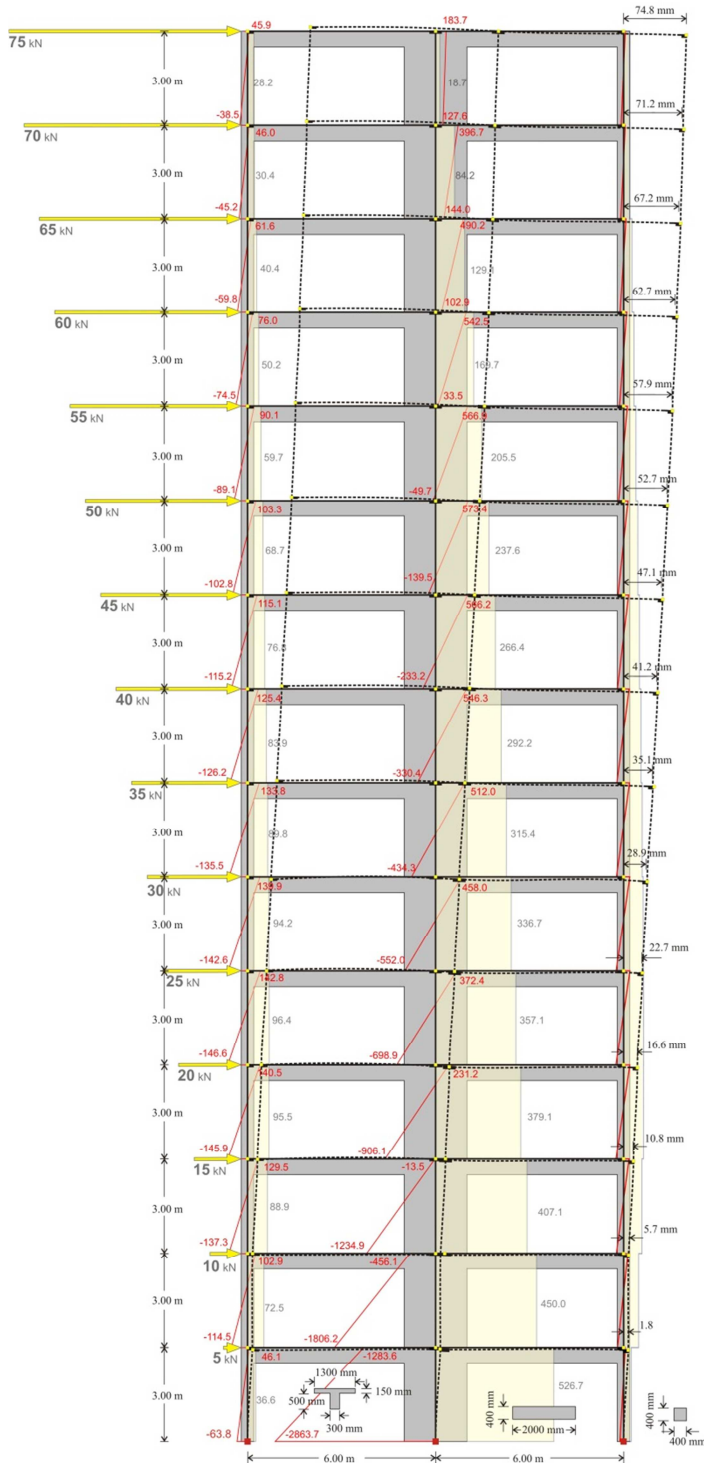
DUAL type structure comprising one wall with a cross section of 2000/300 and two columns with a cross section of 400/400 with cross-sections 400/400 and 2000/300 respectively
